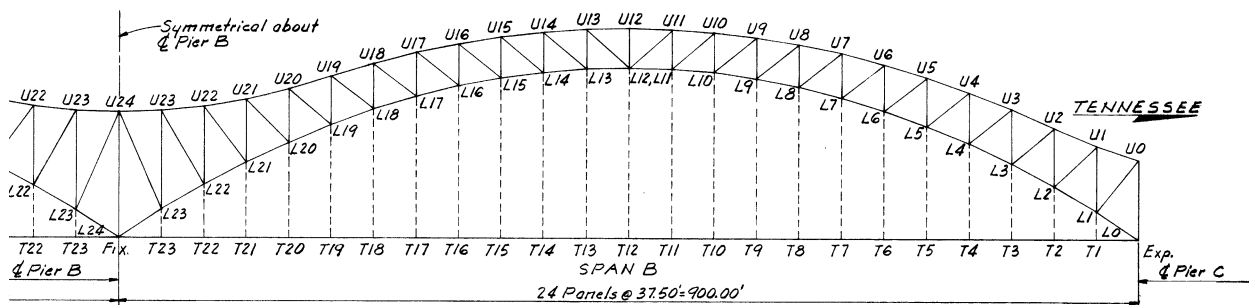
Arch Span B looking north with tie girder connection points labeled T1 to T23 from design drawings.
